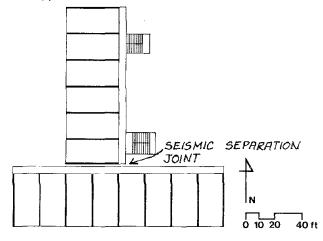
Plan of Sunnyheights apartment building, showing location of seismic joint.
